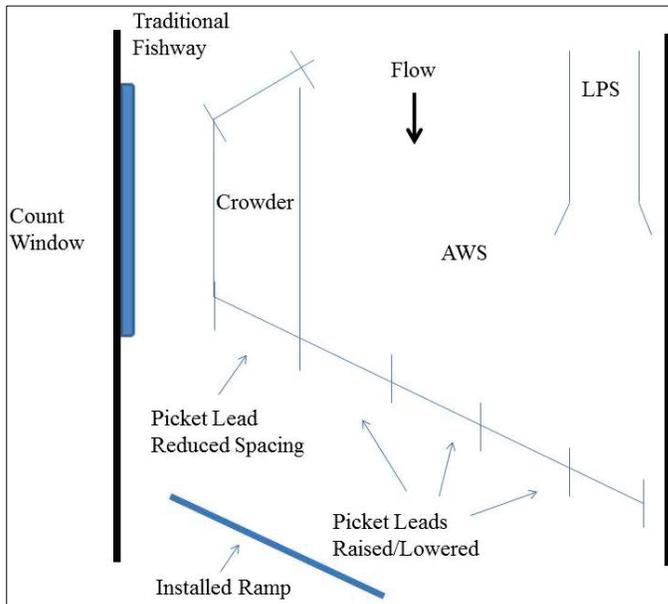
Schematic drawing of structural modifications made to the Washington Shore AWS entrance.
